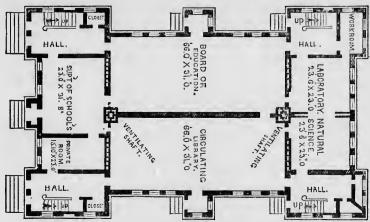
Plan of the Ground Floor of Fig. 211.
